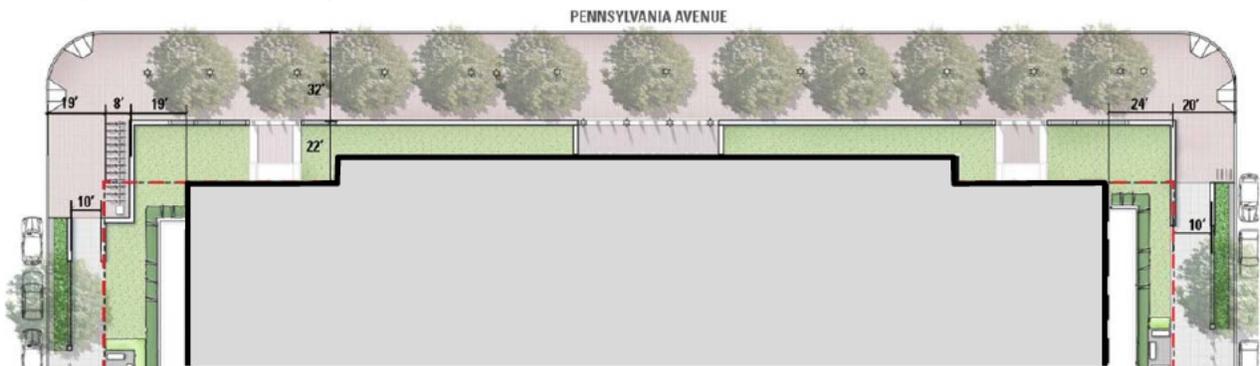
White House Visitor's Center Entrance, Pennsylvania Avenue – Site Plan
